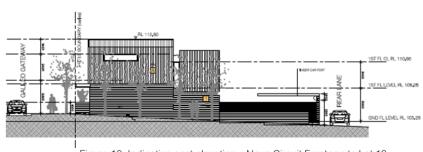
Indicative east elevation – Nova Circuit Frontage to Lot 10
